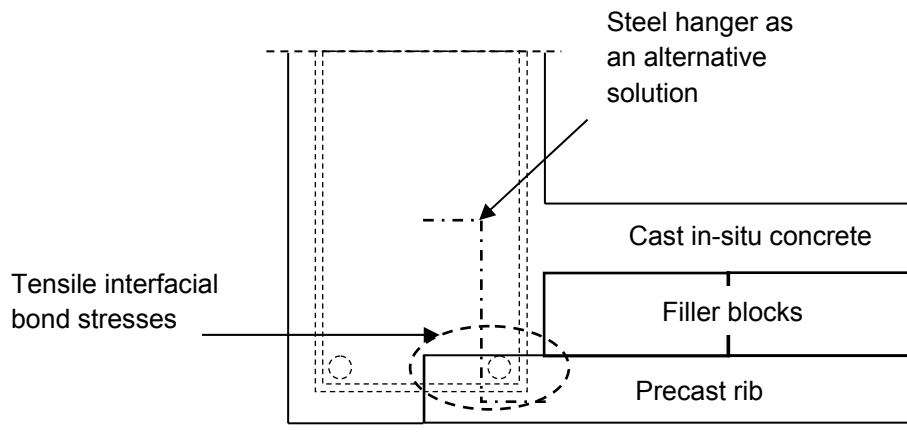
Precast rib connecting into the cast in-situ up-stand beam
